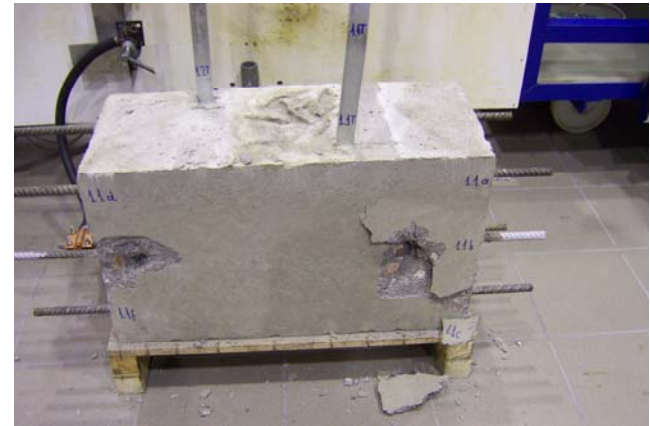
Foundation earthing and down conductors bonded with the reinforcement
